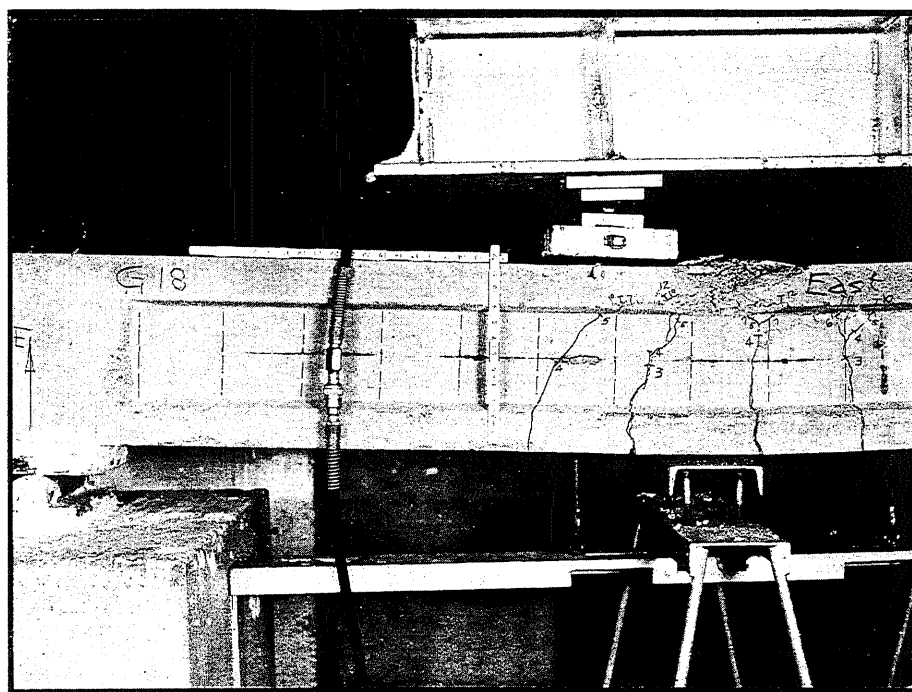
FLEXURAL FAILURE IN A BEAM WITH FOUR WIRES AND STIRRUPS THROUGHOUT THE SPAN
